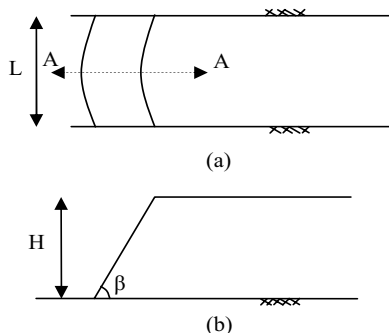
Geometry details of problem (a). Plan (b). Section A-A
